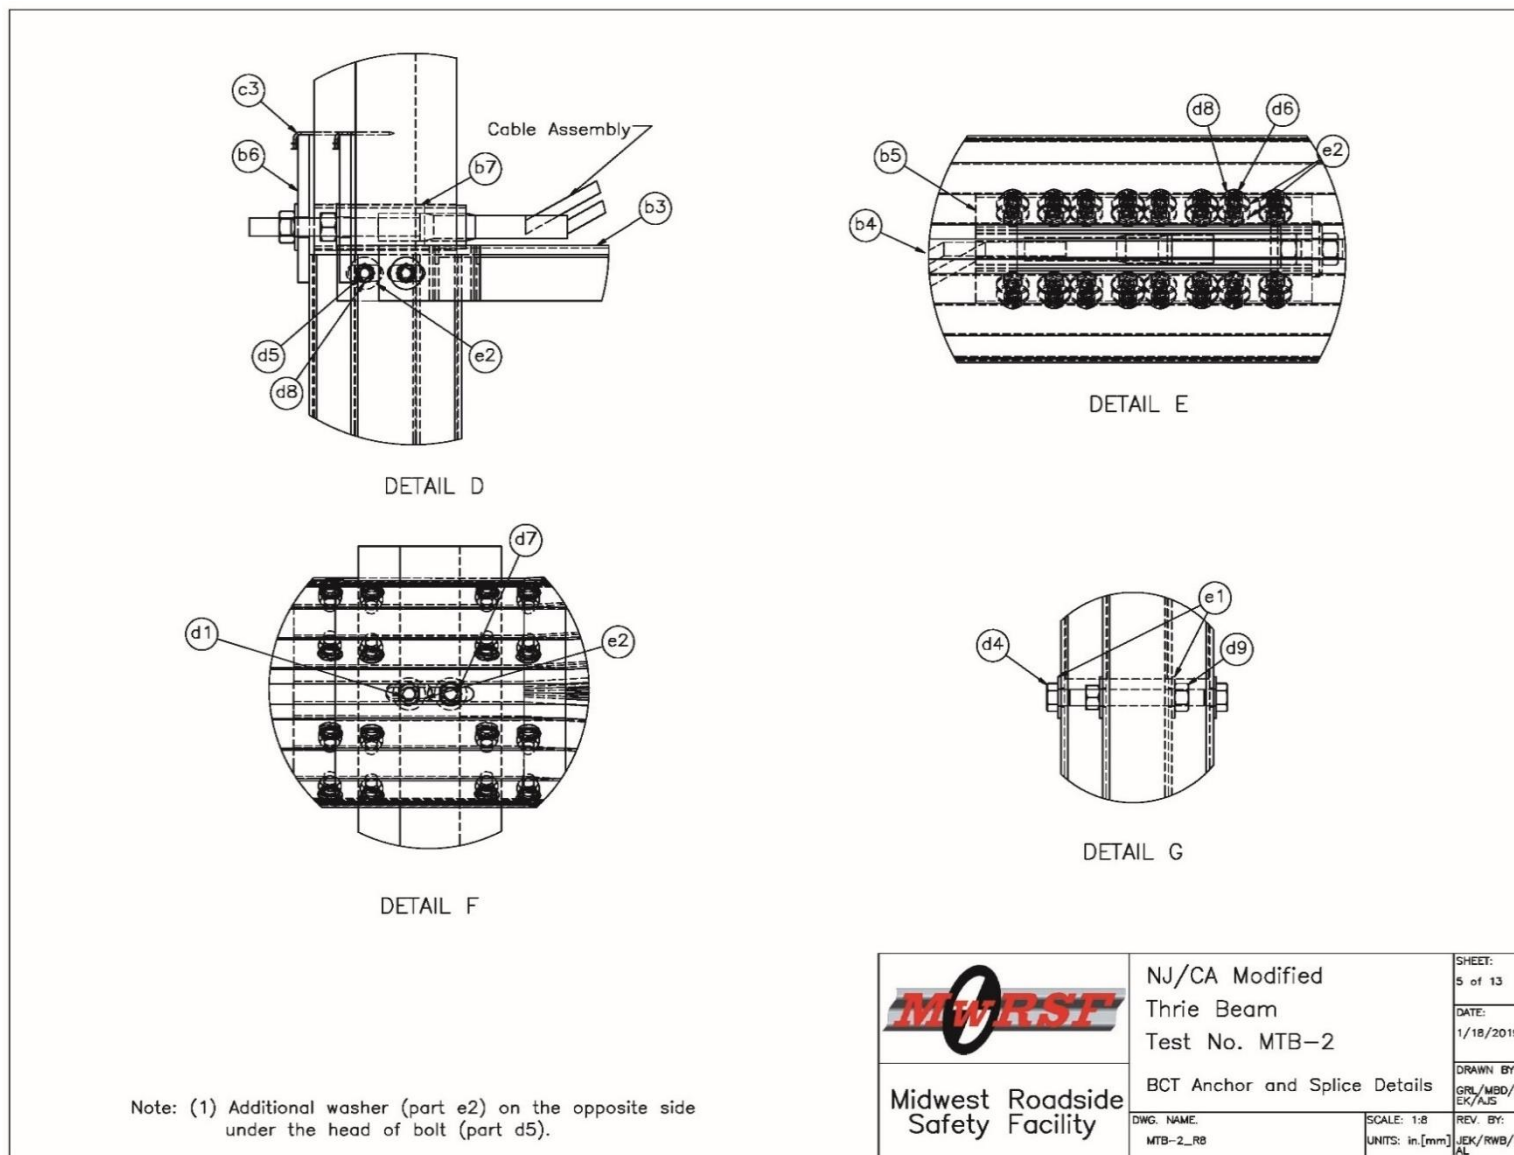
BCT Anchor and Splice Details, Test No. MTB-2
